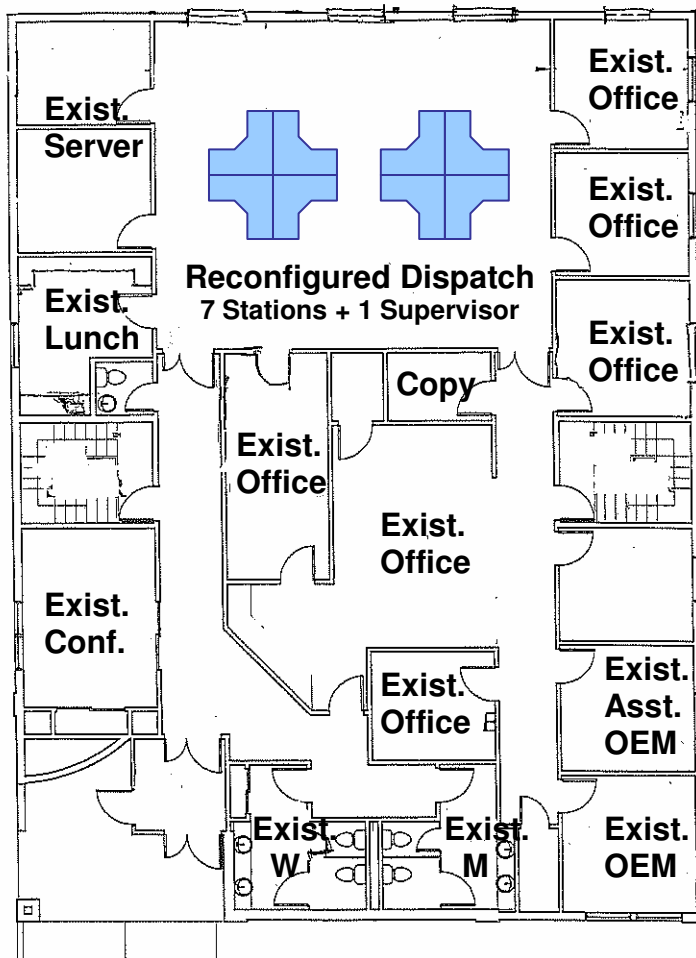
Scenario 1 - Proposed 1st Floor Layout
